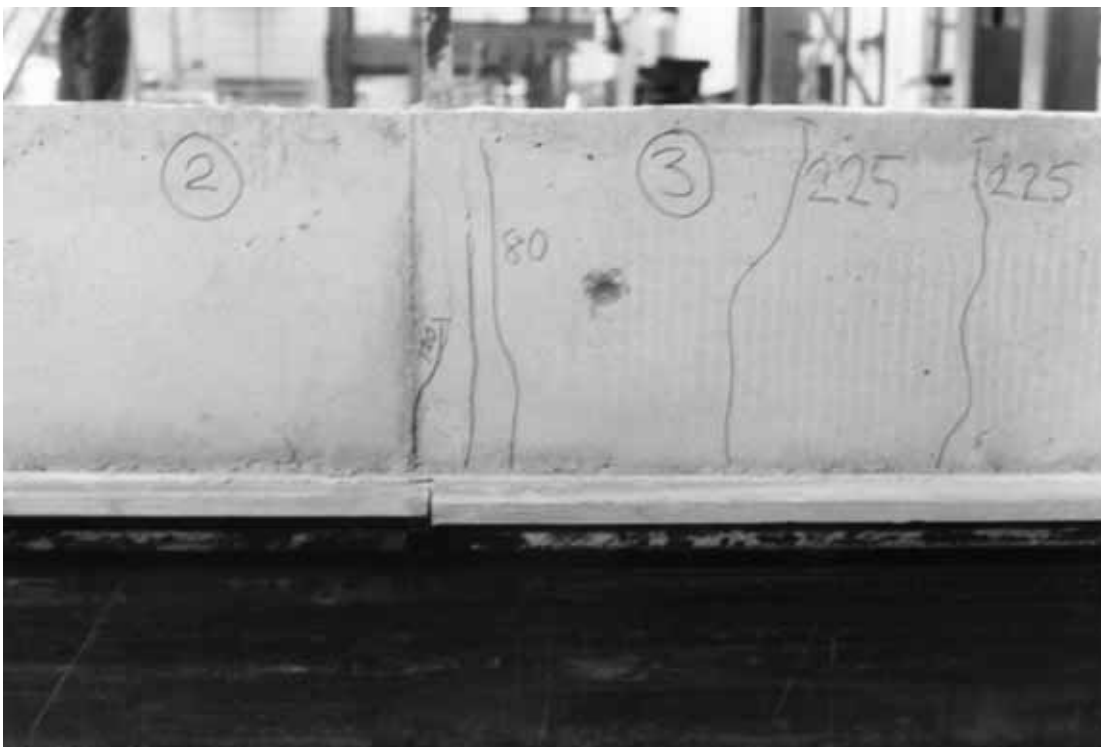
Cracking pattern of tie beam between slab units 2 and 3 at failure of the floor.
